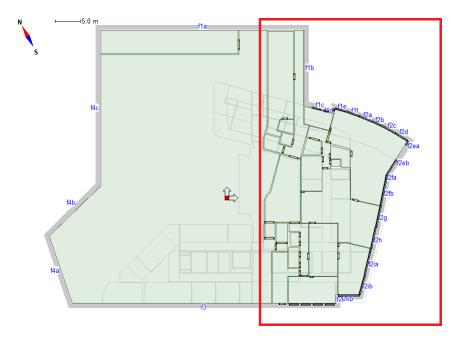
The red area show the part of the basement floor where the laboratories are located in the floor plan of IDA-ICE
